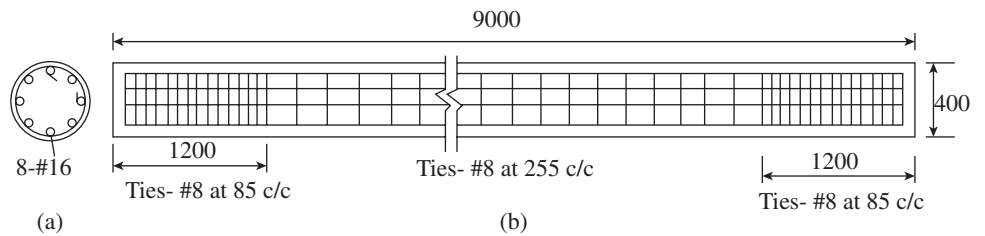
Precast concrete pile of Example 15.8 (a) Cross section (b) Longitudinal section
